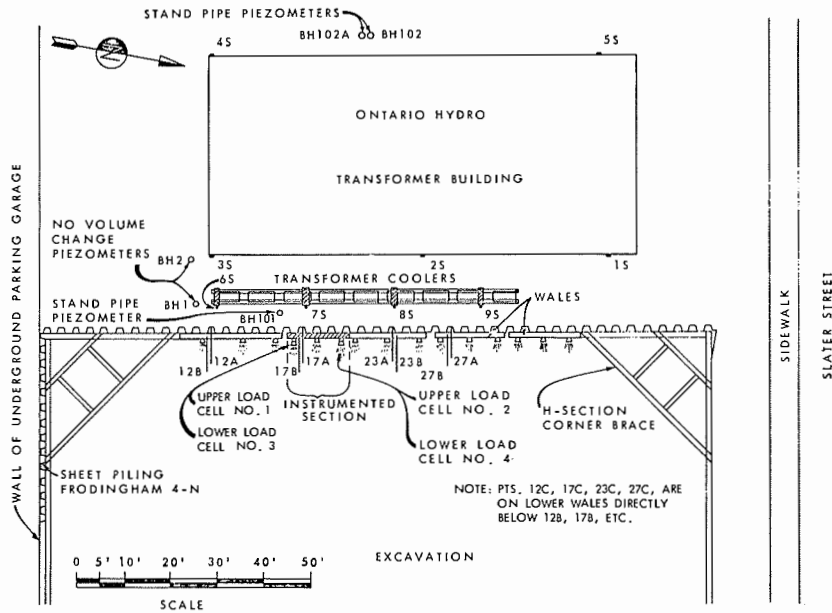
Plan view of tied-back sheet pile wall and adjacent transformer building.
